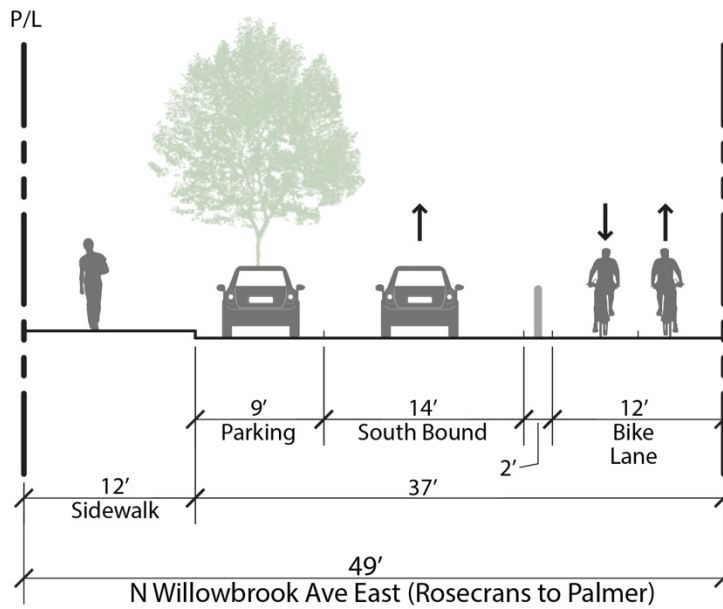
North Willowbrook Avenue East (Rosecrans to Palmer) Typical Cross-Section.
